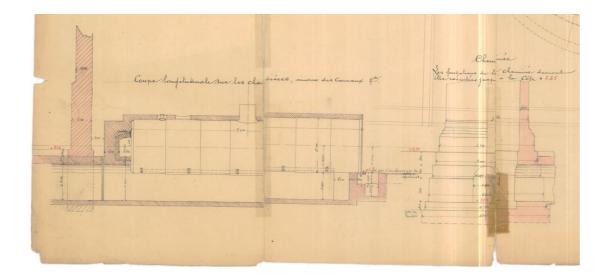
17. Boilers and steam chimney connection section seen in the original drawings of 1898 (source: İZSU Archive)
